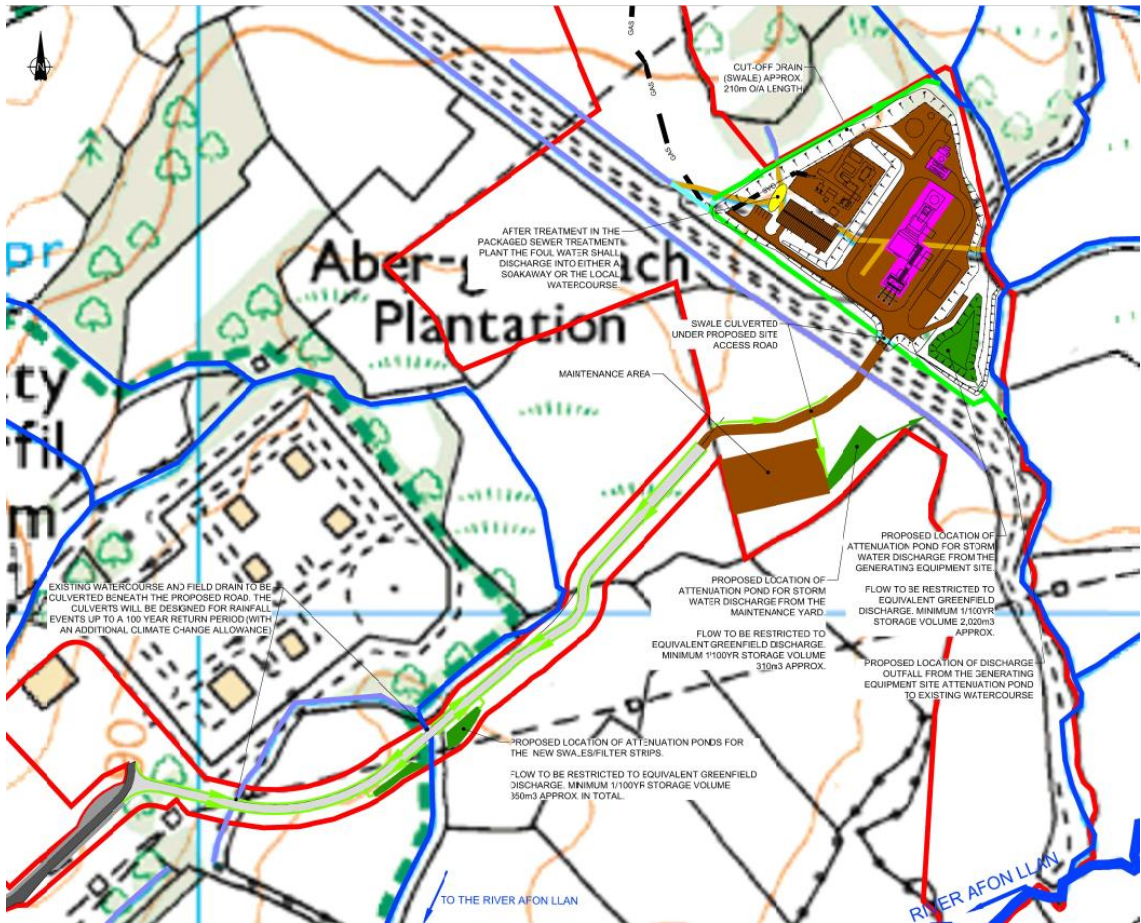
Plan showing nearby drains and watercourse to the site (Central section)
